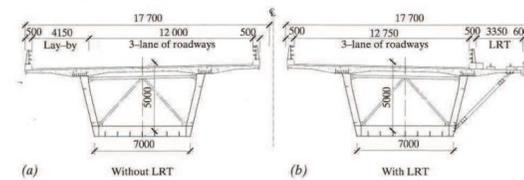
Deck of the composite box girder bridge (Units: mm)
